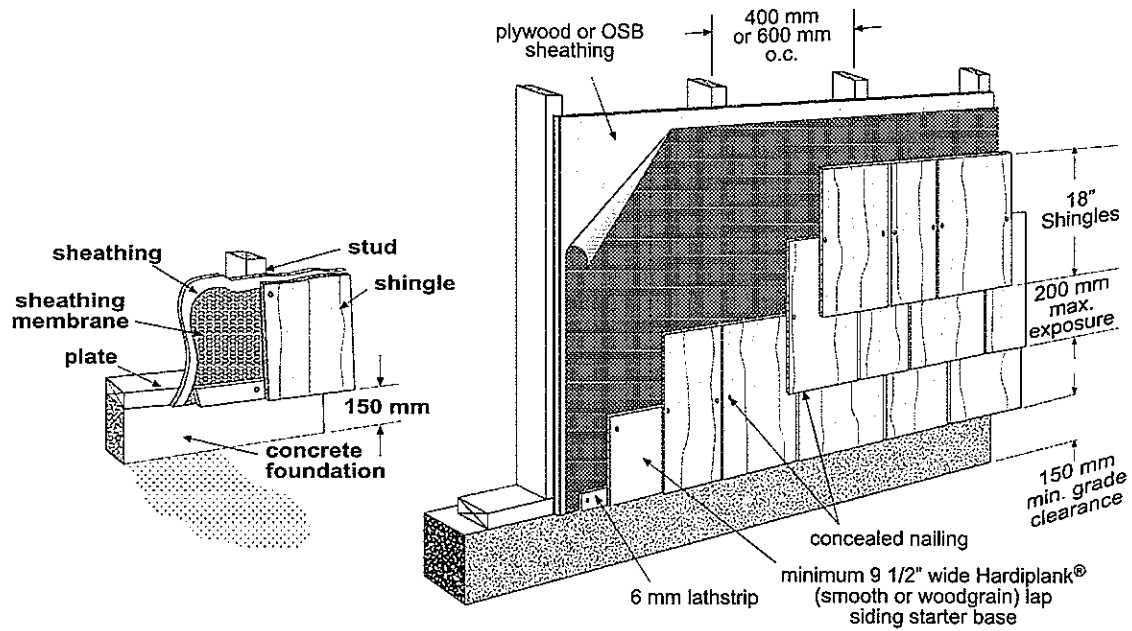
Detail of installation of Hardie® Shingleside® Cladding (Grade Clearance), (Framing Requirements)
